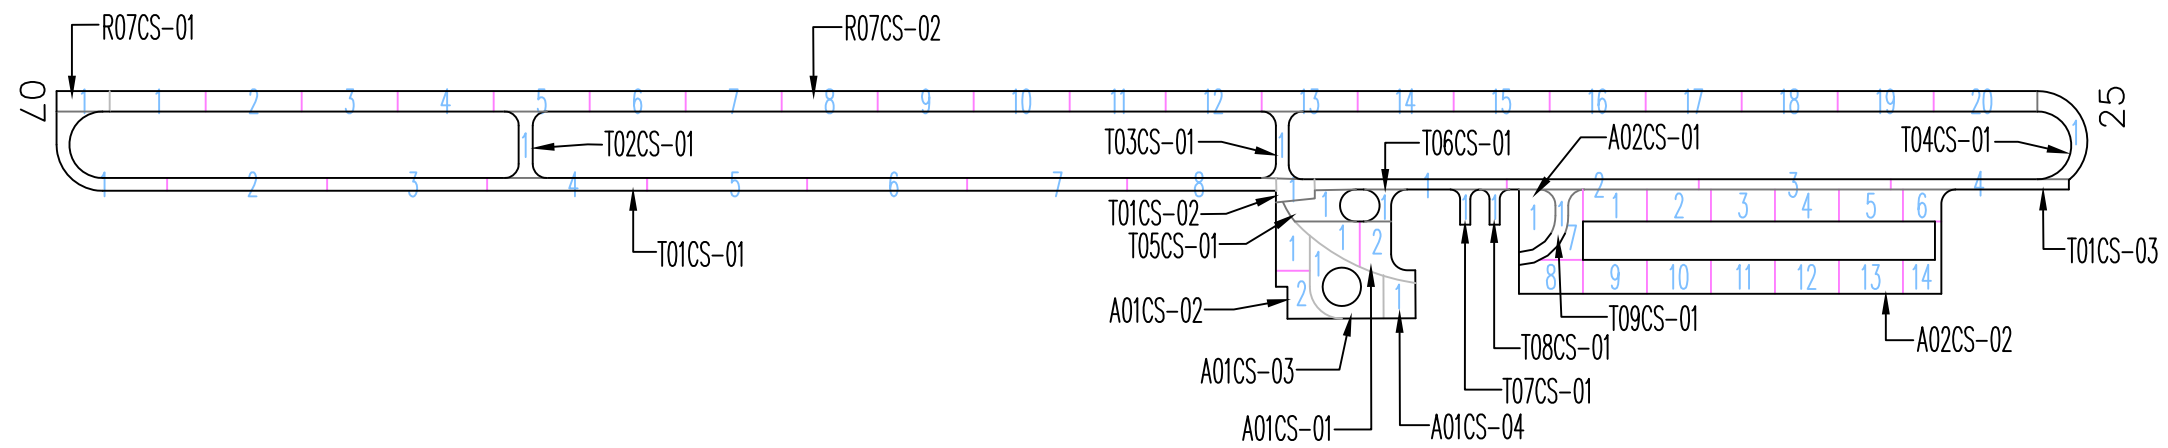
Pavement Branch, Section and Sample Unit Layout.
